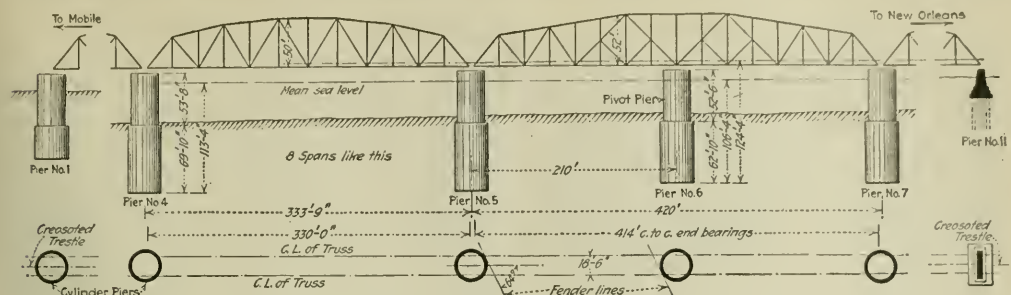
TRUSS SPANS AND DRAW ON DEEP CYLINDER PIERS
